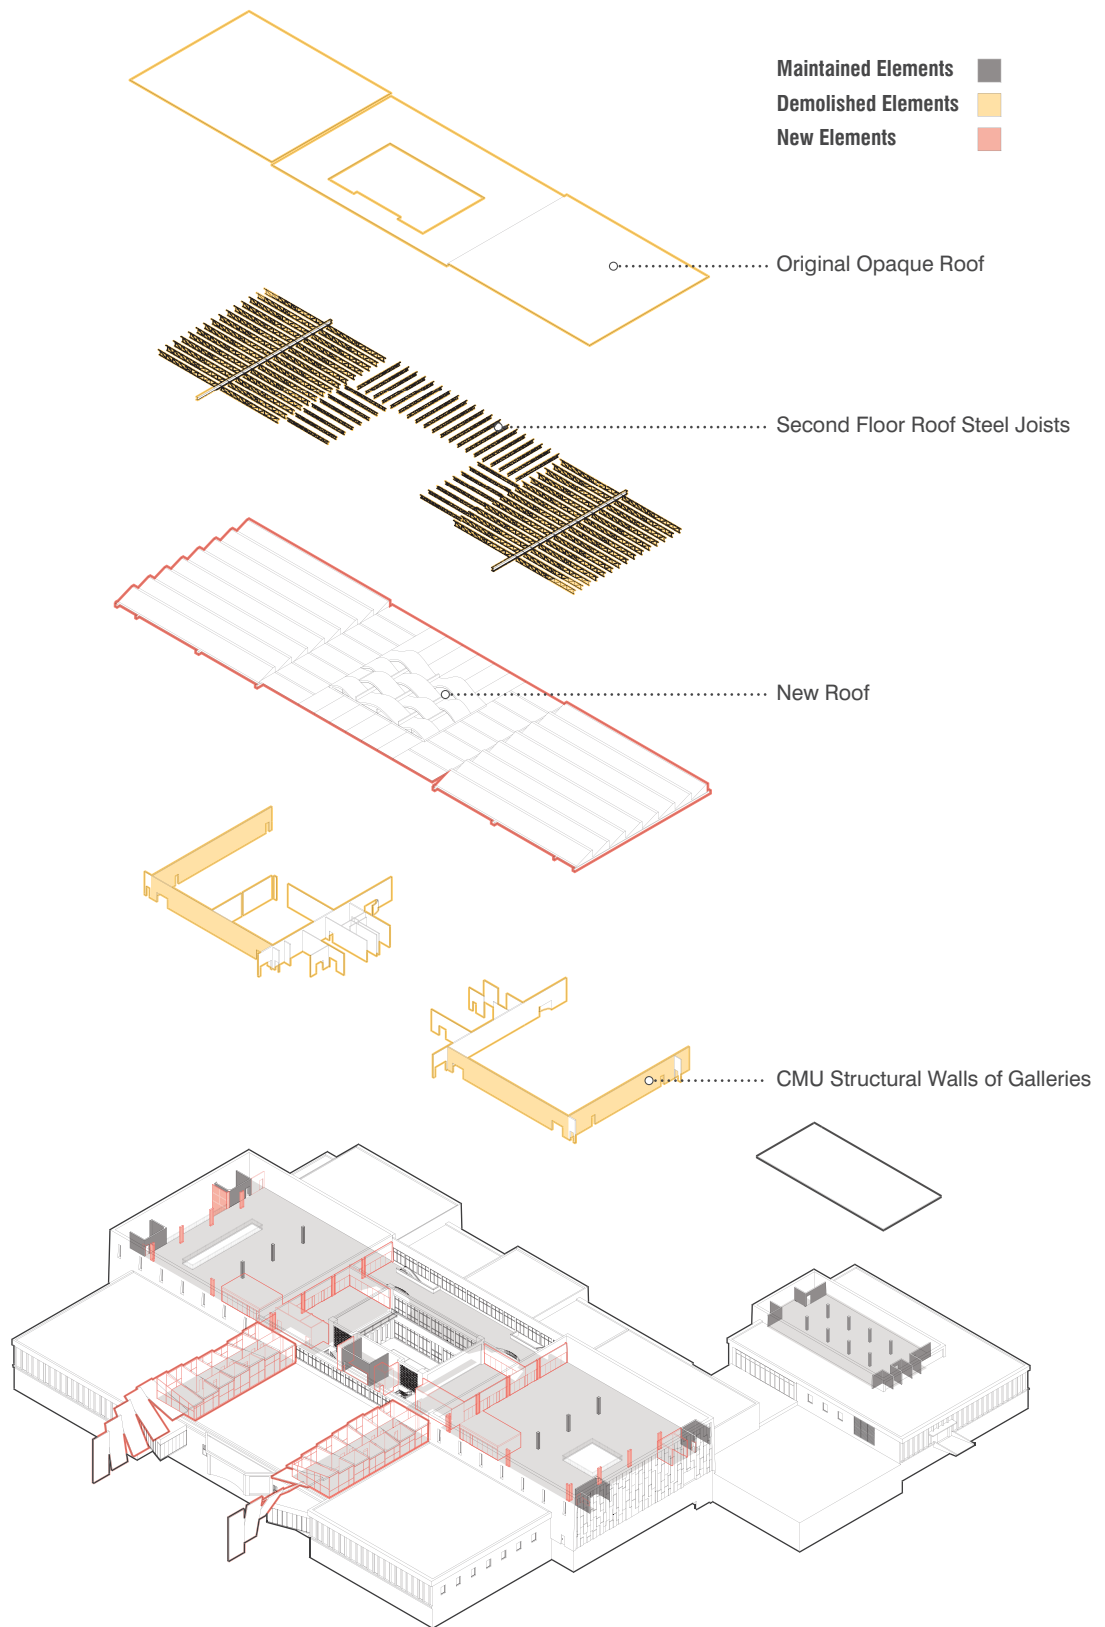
Isometric diagram exhibiting existing and new elements of the second floor
